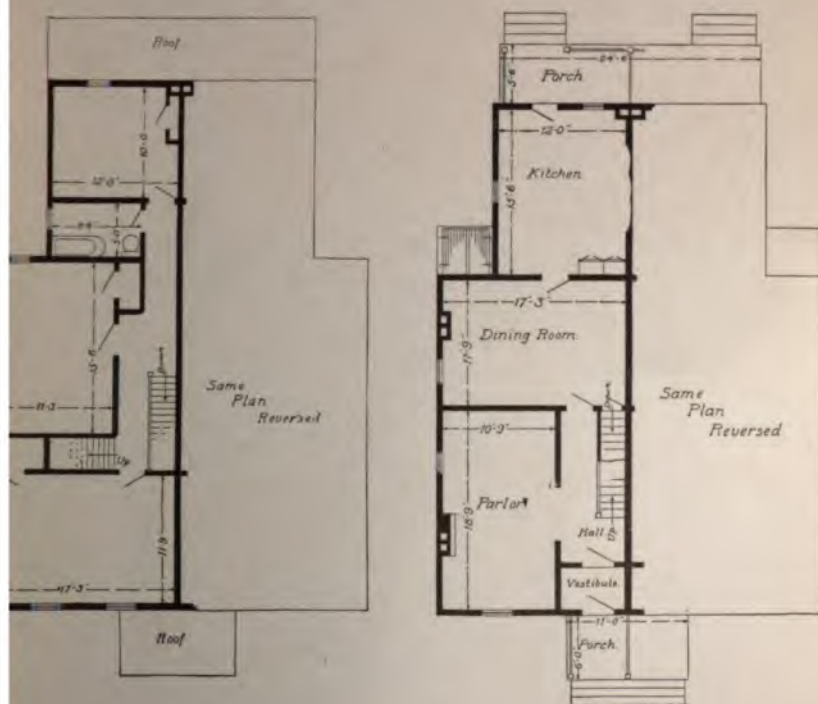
HOUSE FOR EMPLOYEES, PLAN H
